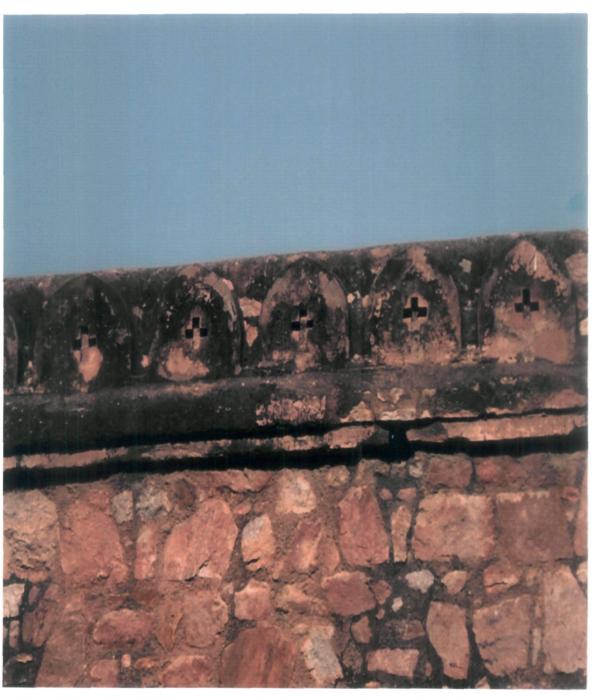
(E): THE outer wall of the building of Khirki mosque, showing the Parapet and building material.
